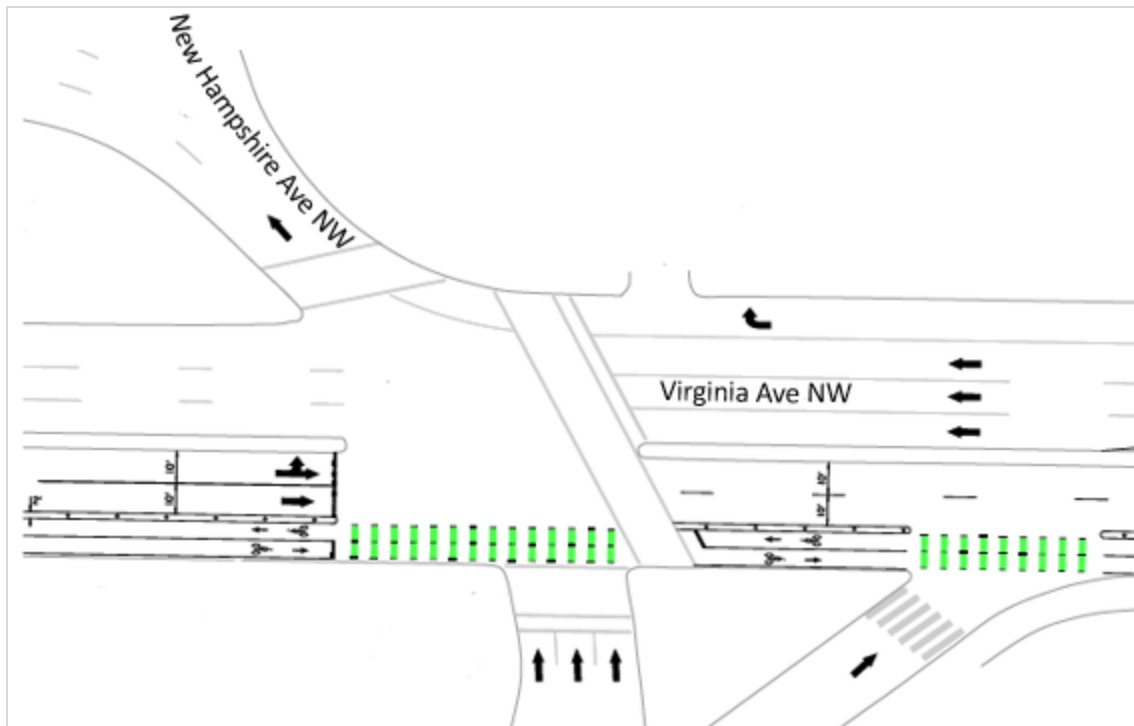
Typical plan view, proposed condition, New Hampshire Ave NW to G St NW.
